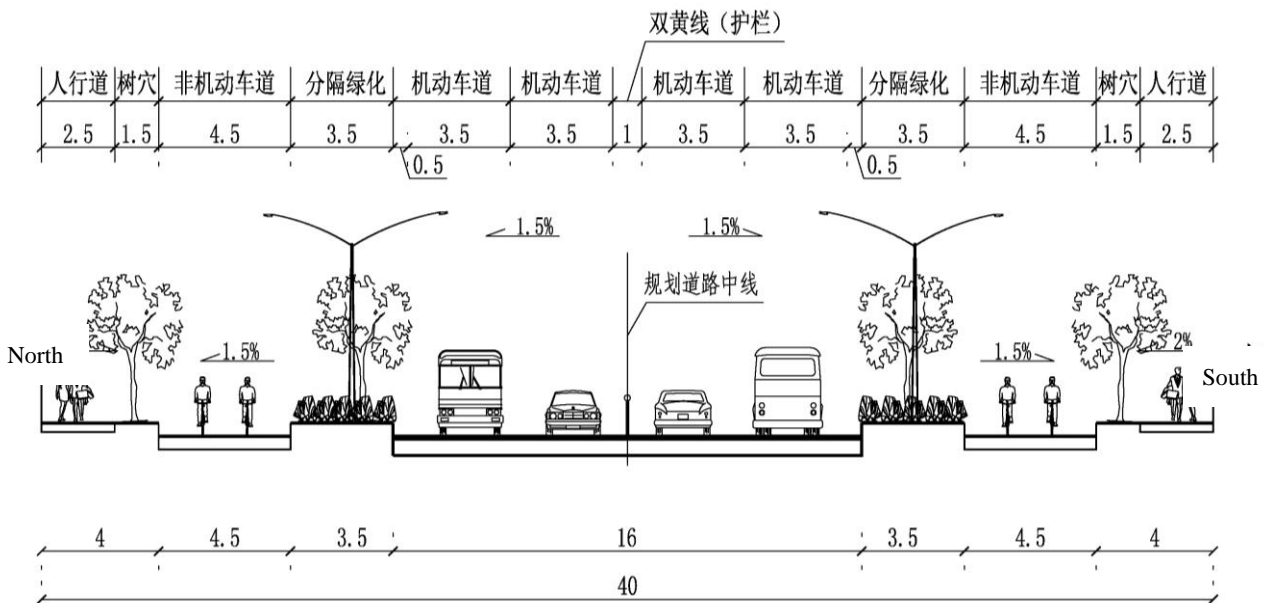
Reconstructed Cross Section of Yinxing Avenue (Fucheng Avenue ~ New G316)
